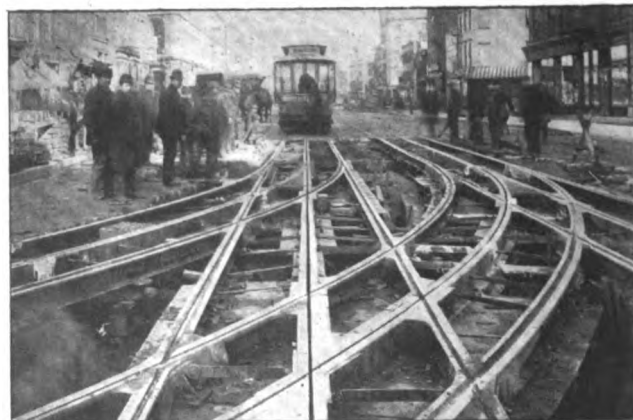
TRACK CONSTRUCTION, SHOWING METHOD OF CROSSING TRACKS OF A SIMILAR SYSTEM.
